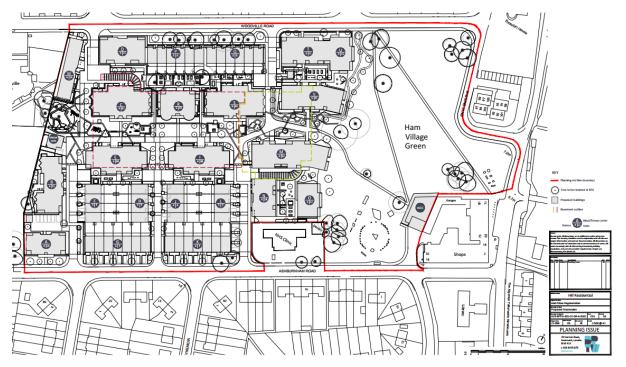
Masterplan providing an overview of the site layout (BPTW drawing HCR-BPTW-S01-ZZ-DR-A-0102-C01)
